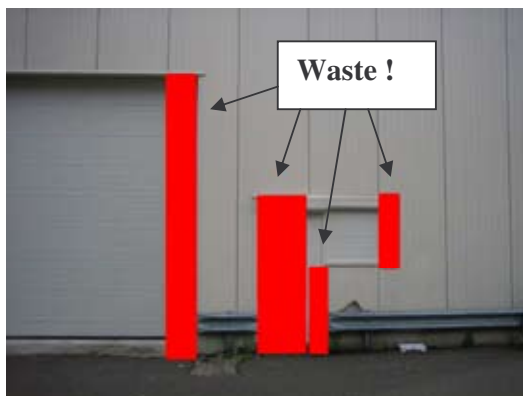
Wasted surface of sandwich panels      Figure 2b With a little extra design no waste
